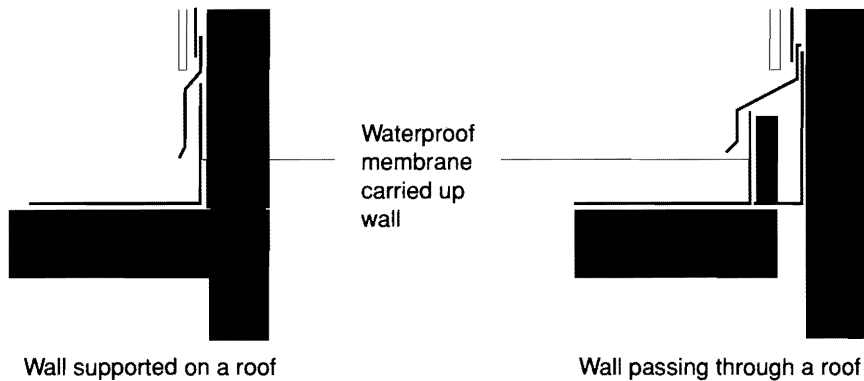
Continuity of waterproof membrane where a wall rises above a roof
